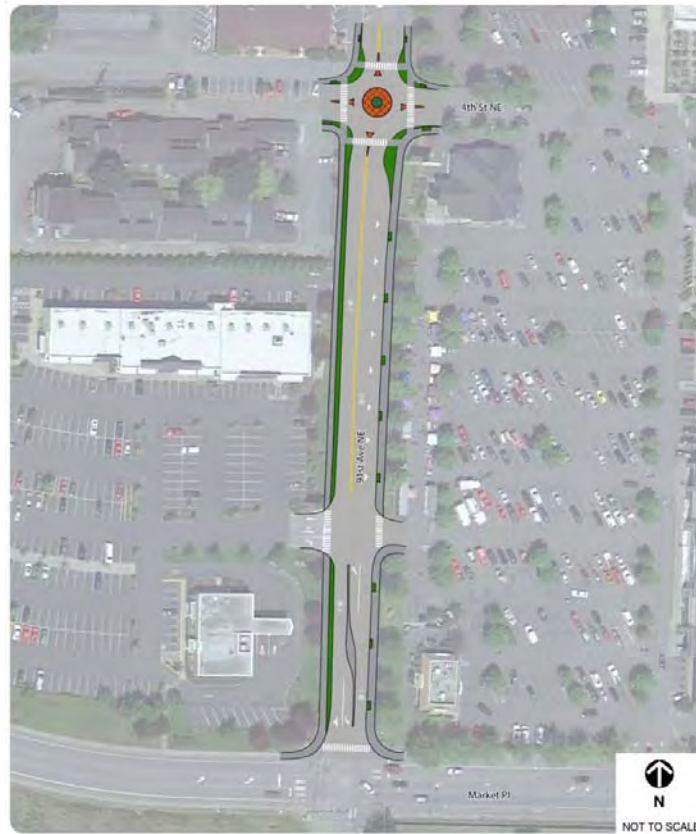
Possible roundabout on 91<sup>st</sup> Avenue NE between Market Street (bottom of photo) and SR 204 (off photo to north)
